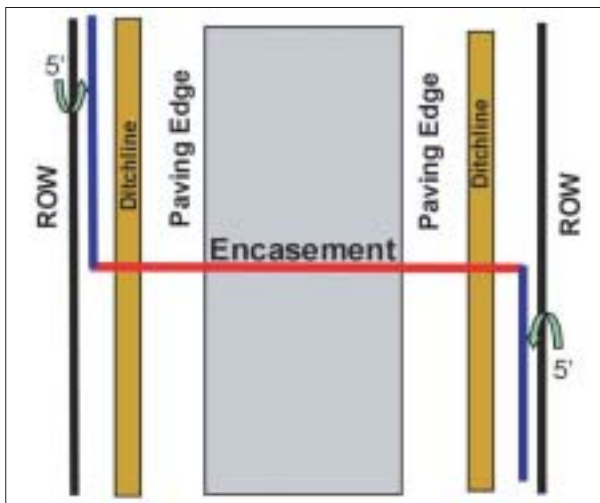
Typical Encasement Pipeline Road Crossing-Parallel Installation. Polyethylene encasement pipeline road crossing (shown here in red) extends from "ell" to "ell," or the point of turn.
